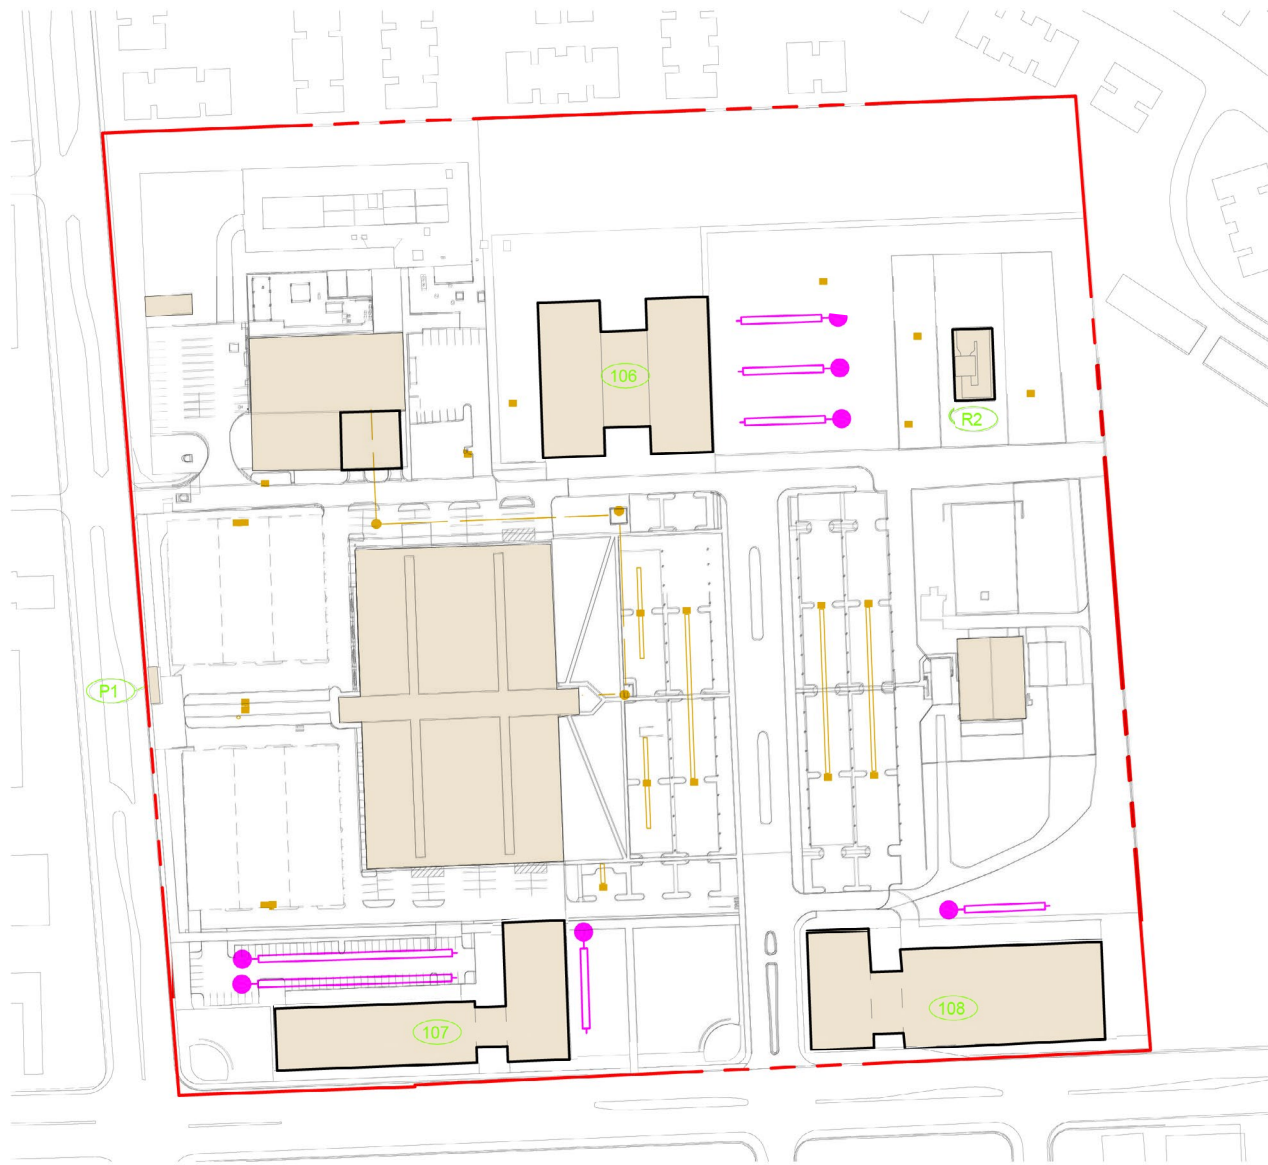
EC 2035 PLAN - DRAINAGE
